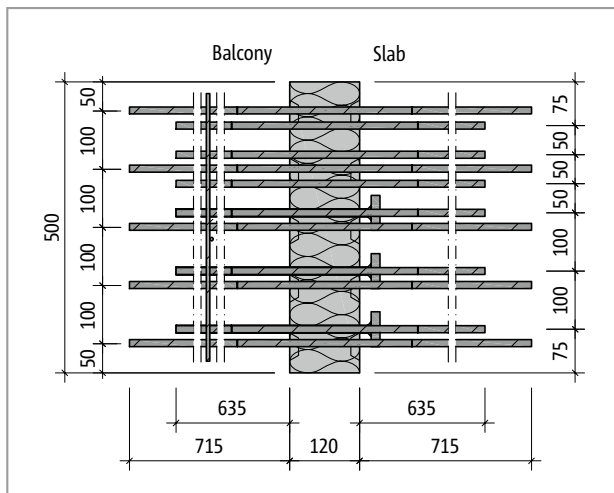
Schöck Isokorb® XT type C-L-M2-V2: Product plan view
